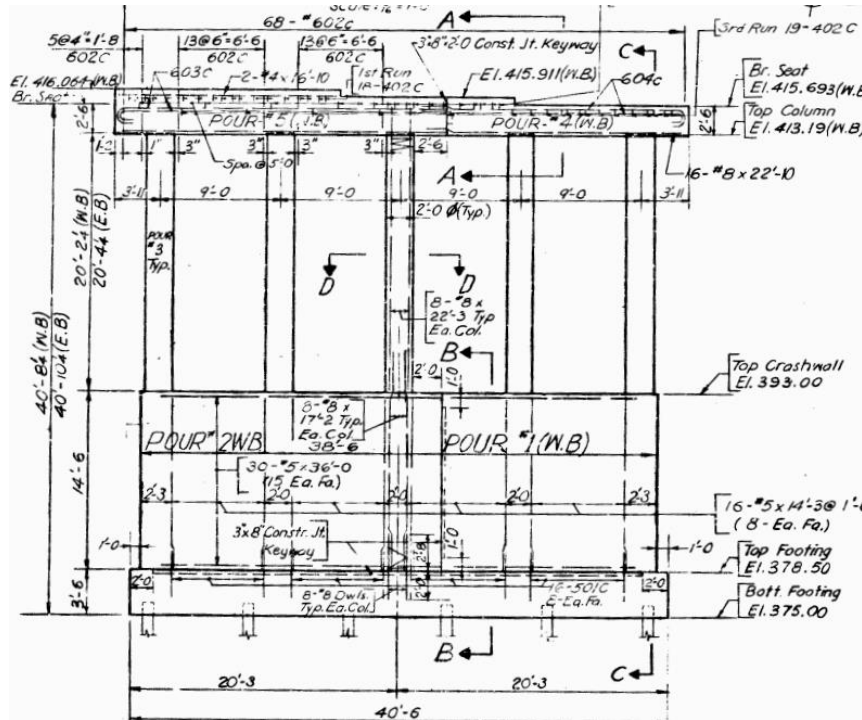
Typical Elevation of Piers for Structure I64-07-02367 BEBL (NBI 33280) (INDOT, 1964)
